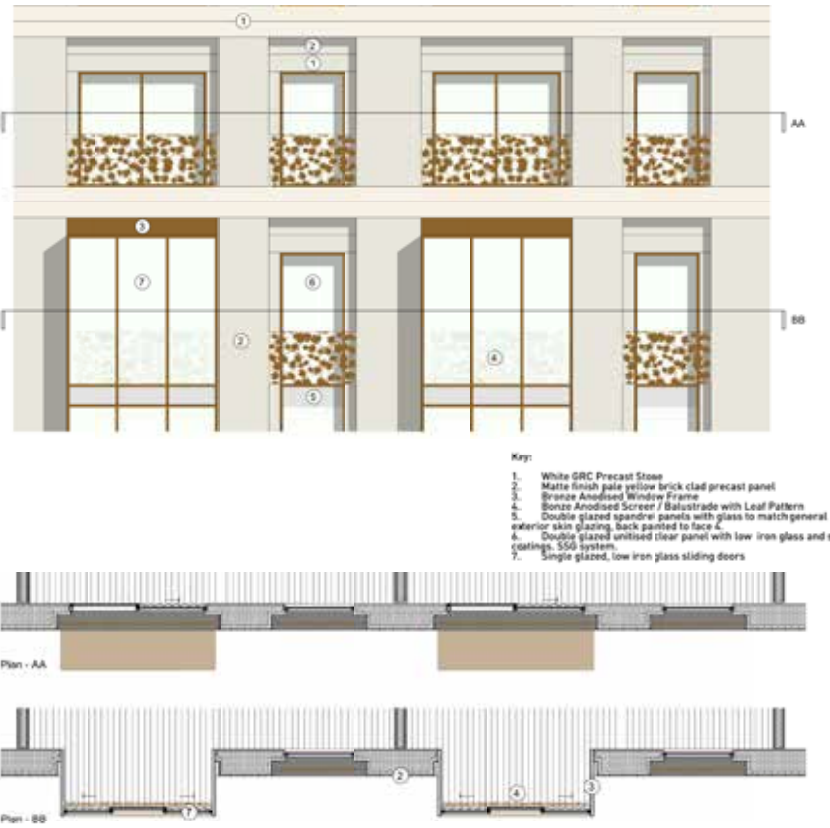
Typical elevation bay study of the building onto Courtfield Road
